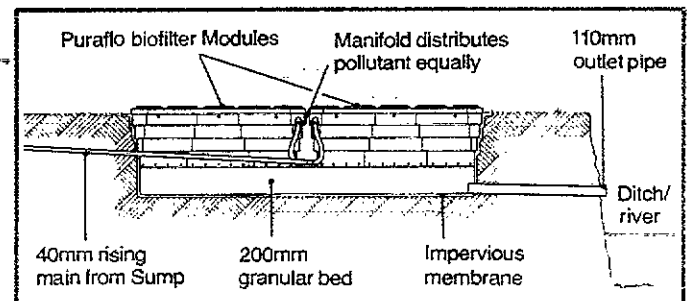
(a) Puraflo system discharging treated effluent into open ditch, stream or river
